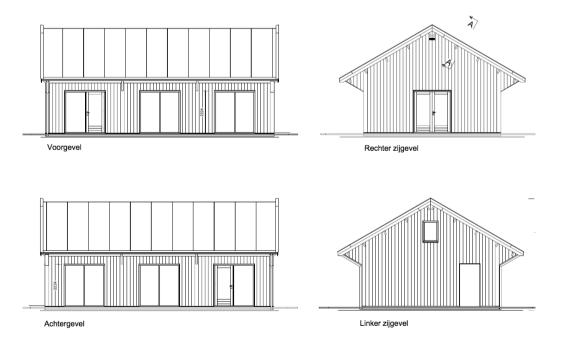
The layout of the co-working space of the Startup Village (Source: Geldersche Houtbouw 2017)
